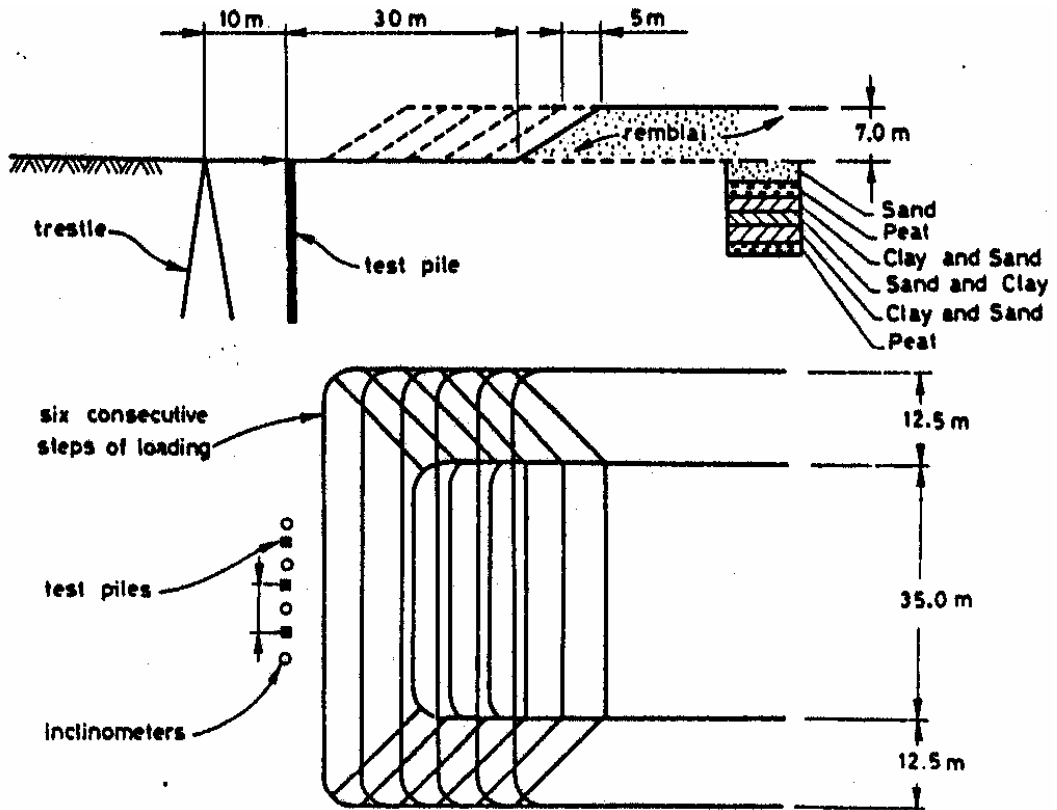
Loading test set-up at Amsterdam (after Marche, 1973)
